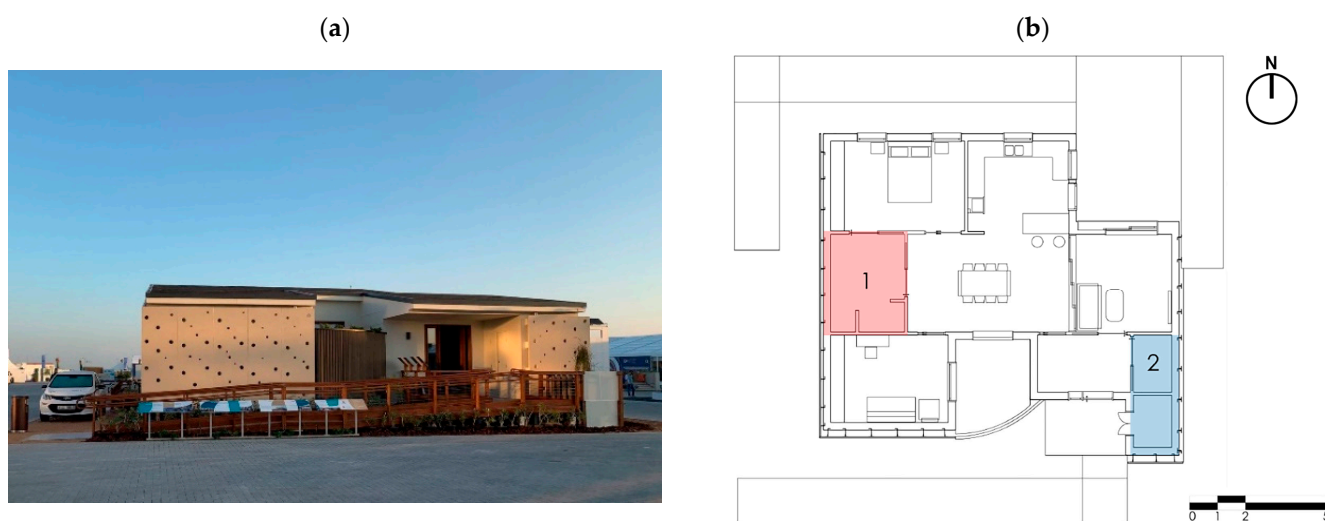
(a) Team UOW’s house photo. (b) Floor plan—1: bathroom; 2: bathroom and plant room. (Photo: SDME 2018 Organization. Floor plan: by authors based on team UOW’s drawings).
